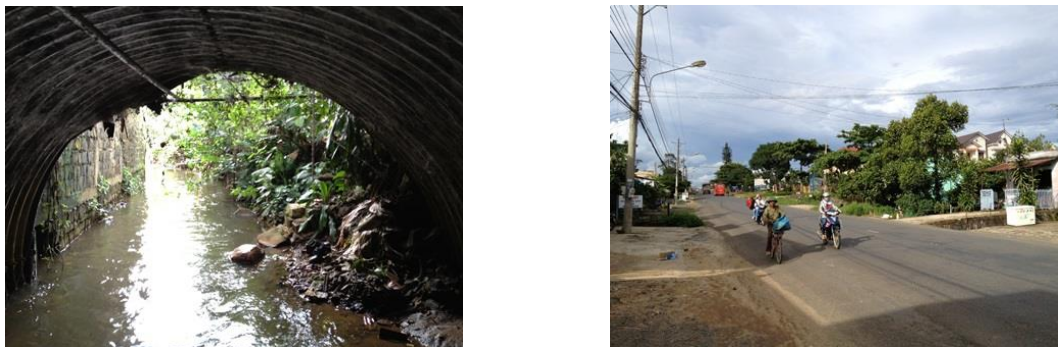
Steel corrupted culvert (Lam Dong Prefecture)
